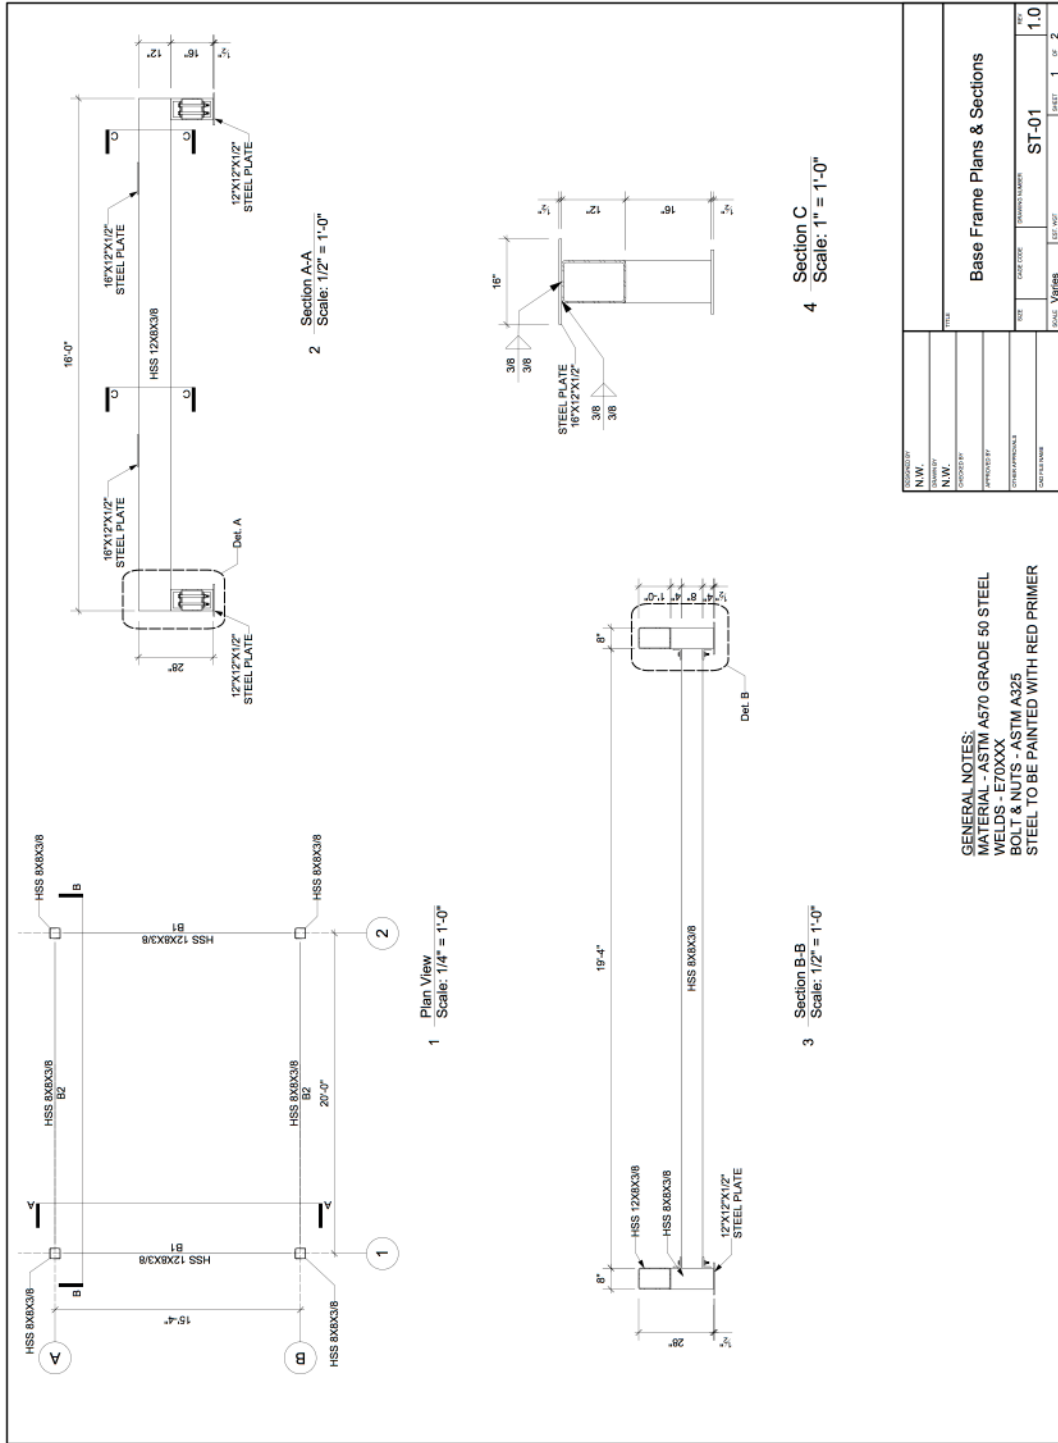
Test frame shop drawings “Base Frame Plans and Sections”
